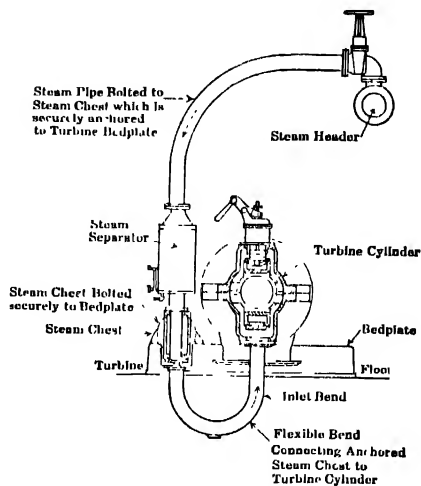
Separator Applied to Steam Turbine — Overhead Steam Main.
